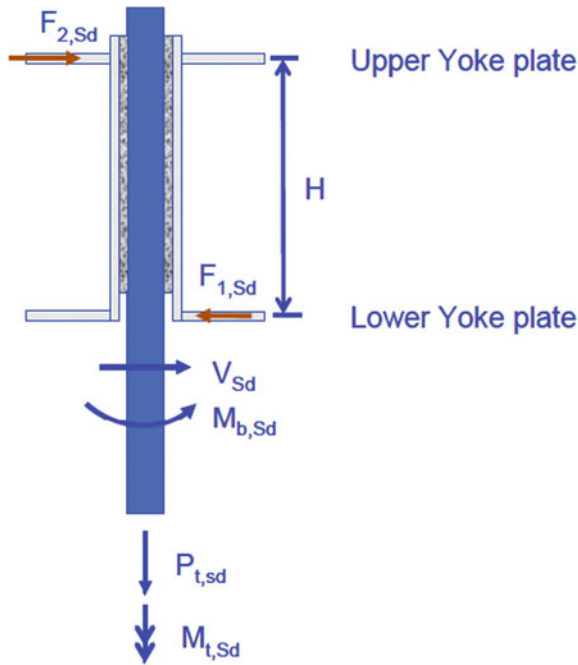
Actions on a pile grout connecting a substructure with pile foundations (courtesy of Standard Norway)
